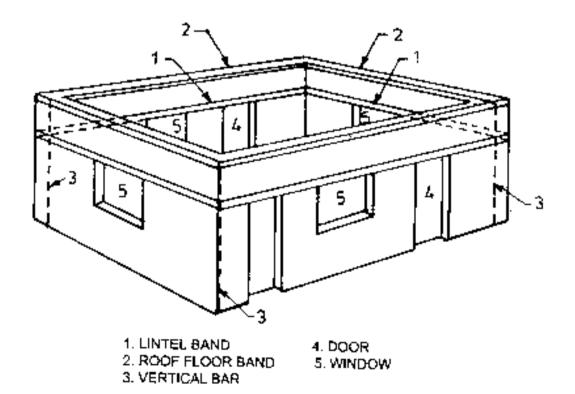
OVERALL ARRANGEMENT OF REINFORCING MASONRY BUILDINGS
